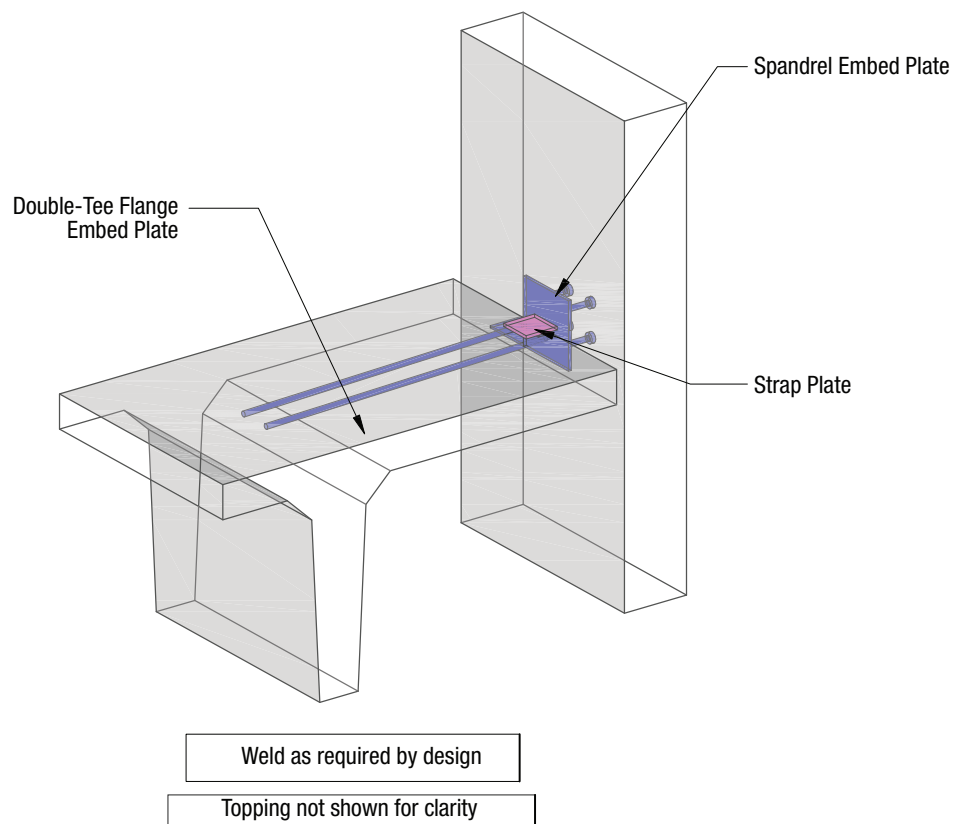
Tee Flange to Wall or Non-Loadbearing Spandrel
